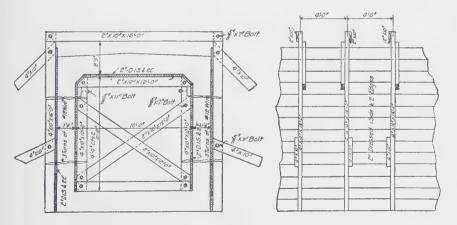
Forms for 10 \times 10 ft. reinforced concrete box culvert, C. B. & Q. Ry.
